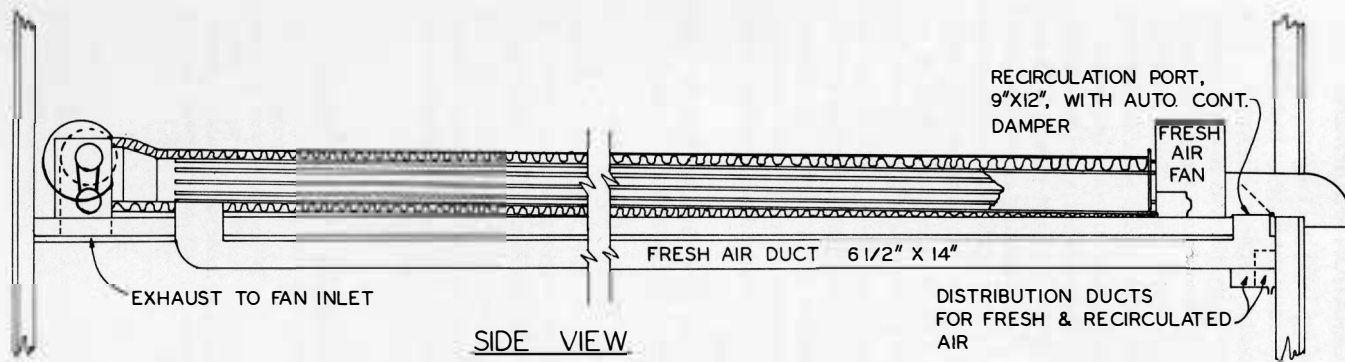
Plans for the heat exchanger installed in the poultry laying house at the Central Substation, Highmore.
